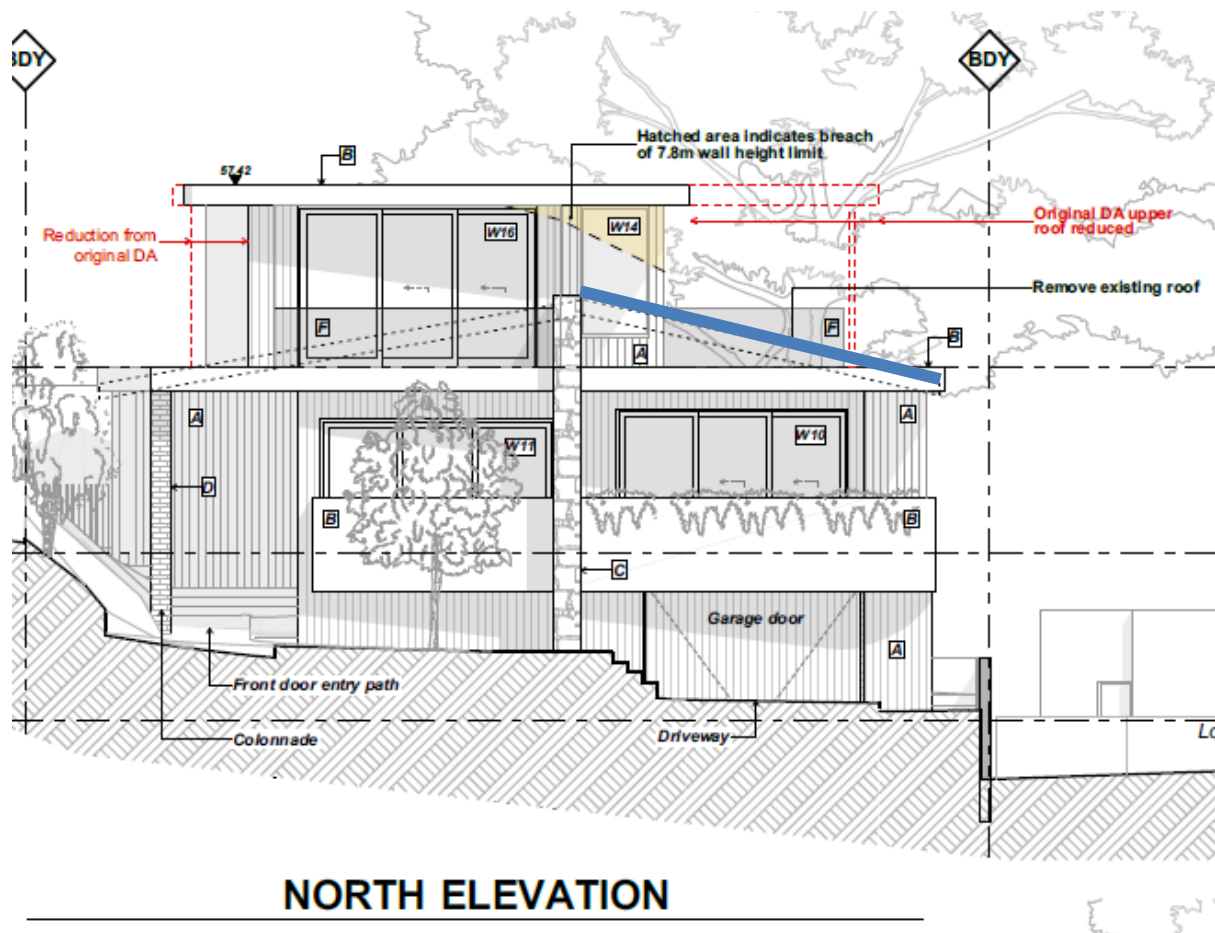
Plan extract showing the height and alignment of the existing pitched roof form over which existing views are obtained (existing roof shown with blue line).
